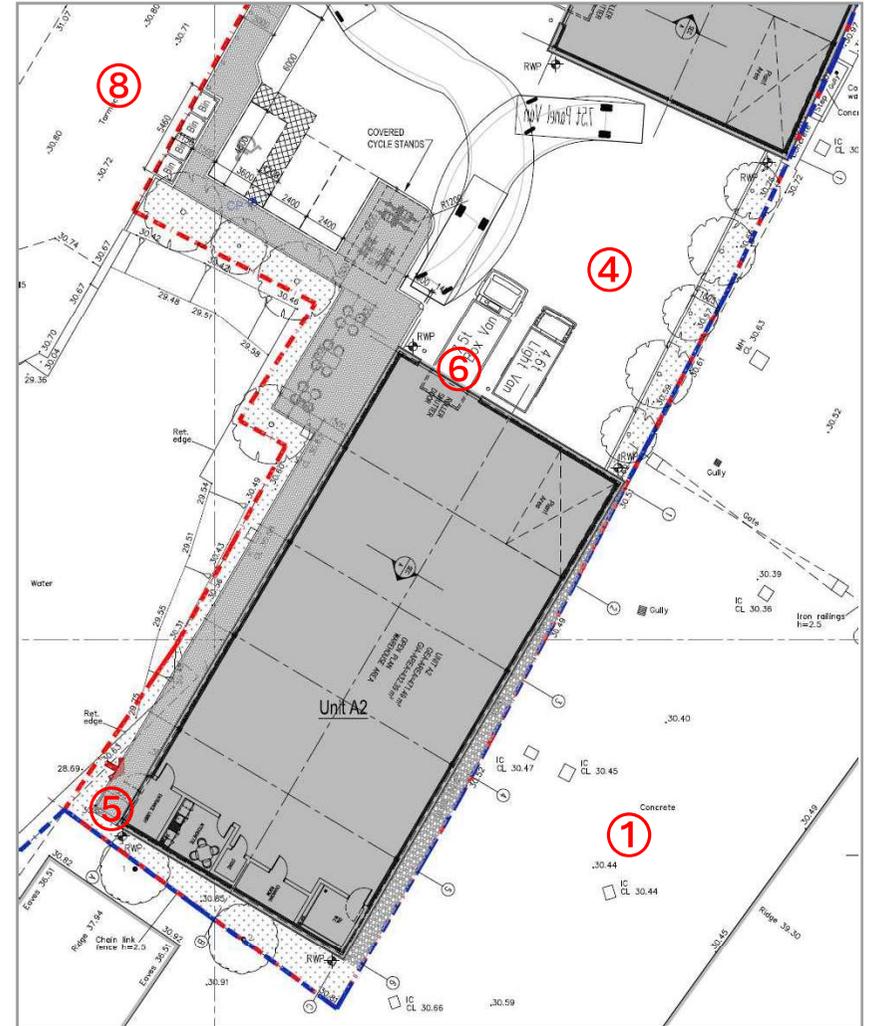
C Site Layout (extract from Drg. No. 122016 P1002 P03)
